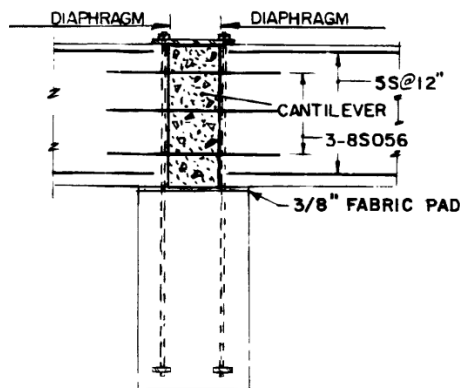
Section depicting PT anchor plates and tie-down rods at end span cantilever supports (Sheet 143, Detail Sheet 8 of original plans, 1967).
